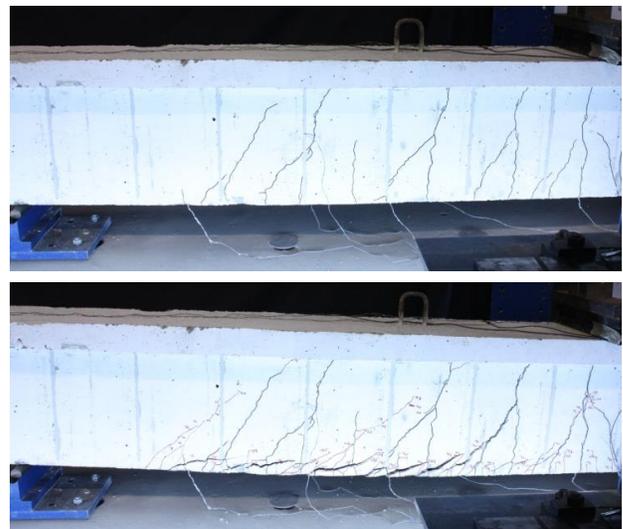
Crack pattern at the left span of the strengthened T-shaped RC beam: (top) at imposed deflection of $L/250$; (bottom) right before failure.
